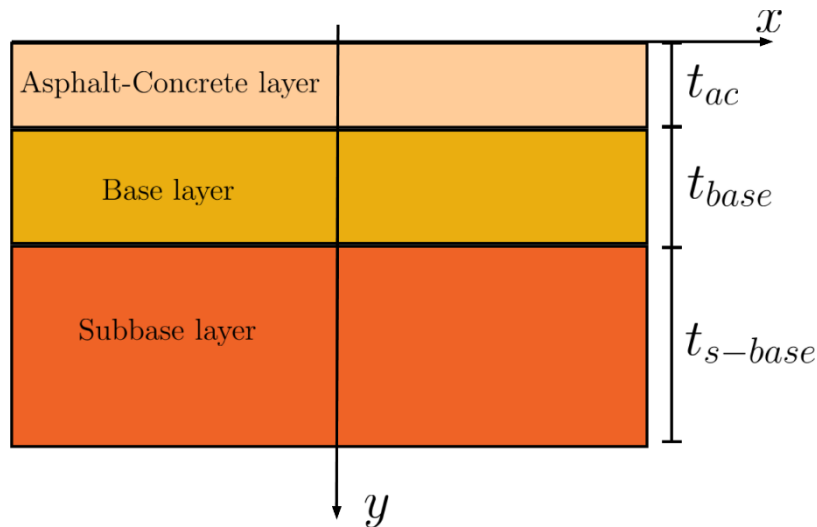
Cross-sectional schematic of an asphalt-concrete pavement system.
